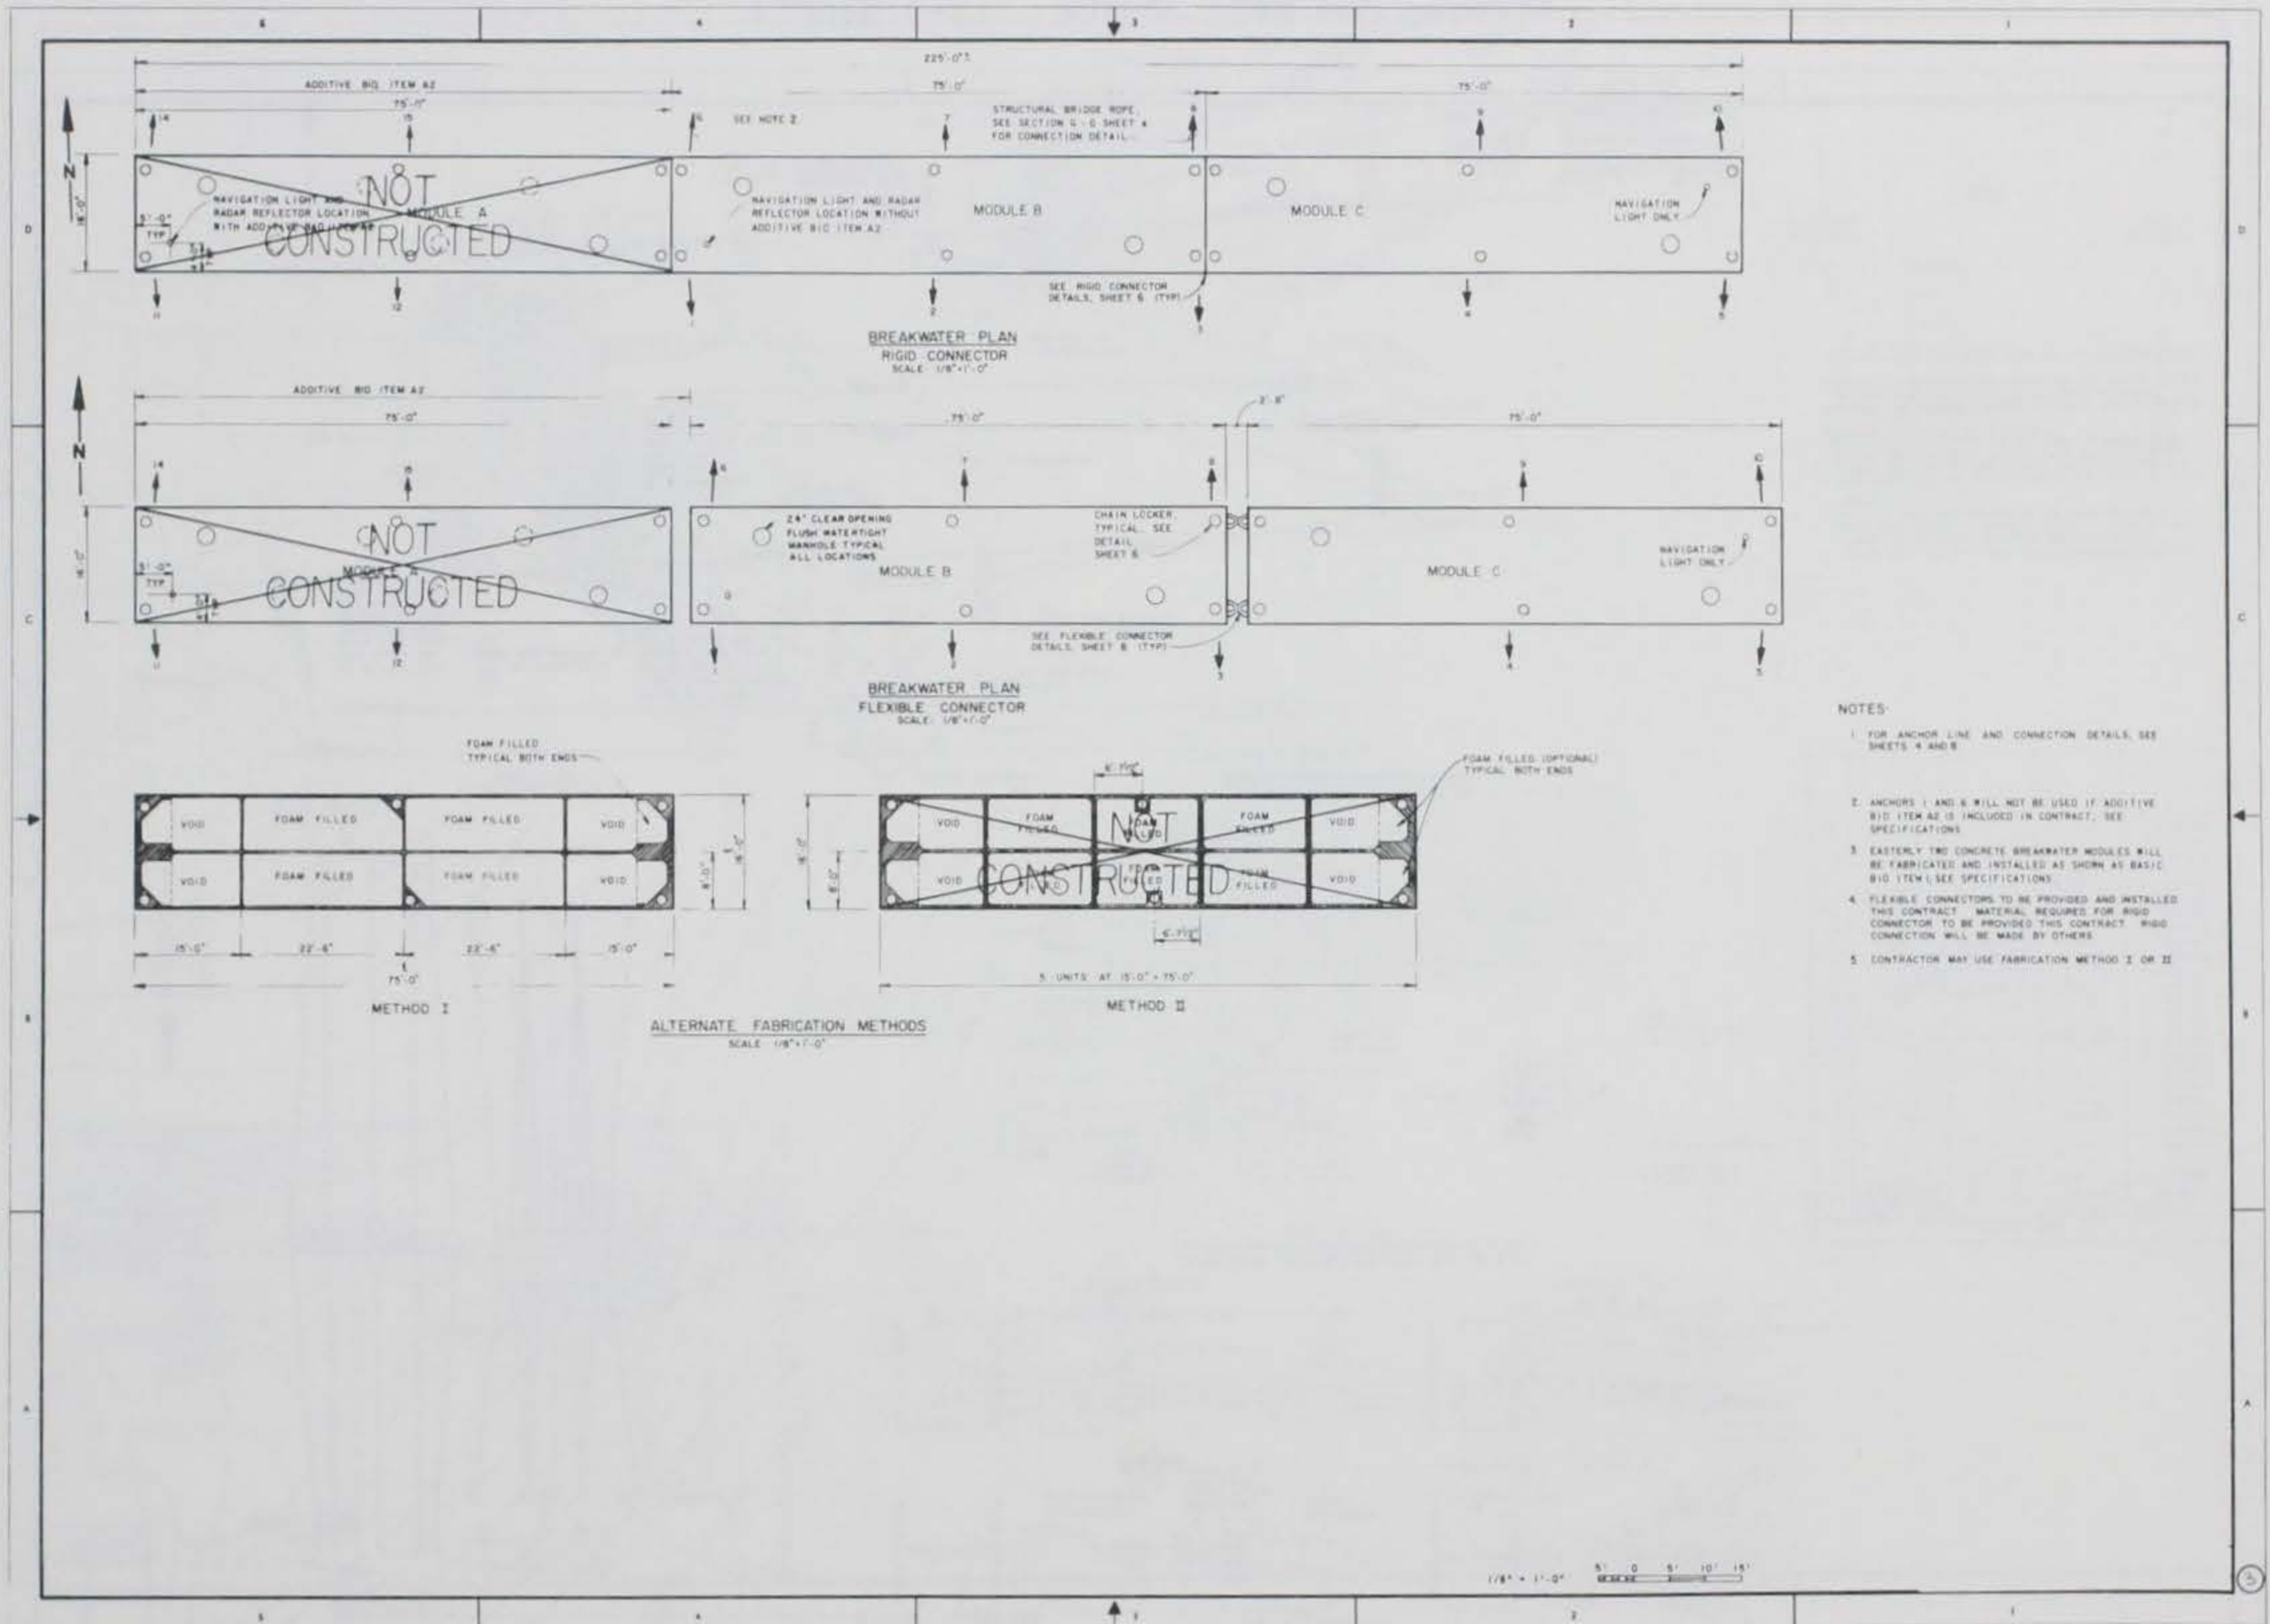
Concrete Breakwater Plan and Alternate Fabrication Methods
